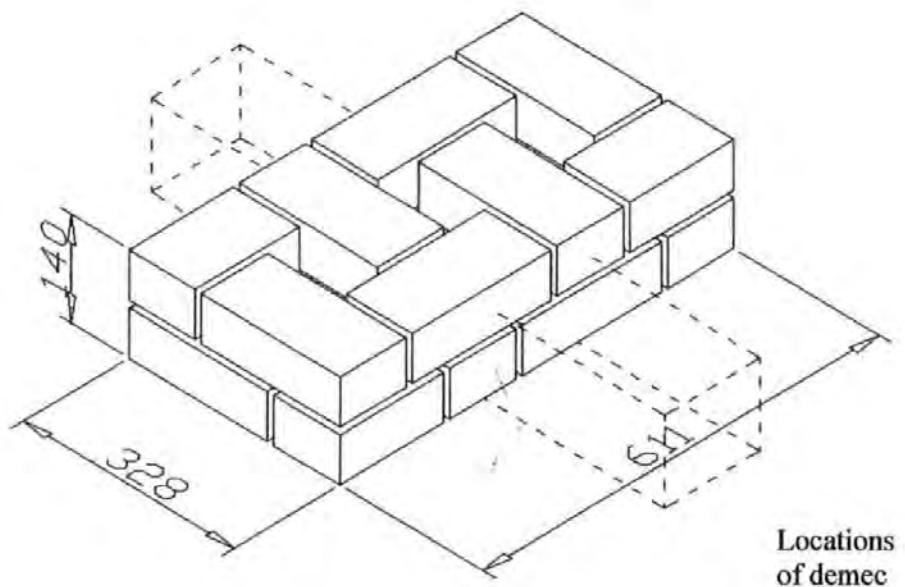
Typical UOP Quetta Style Beam prism specimen
